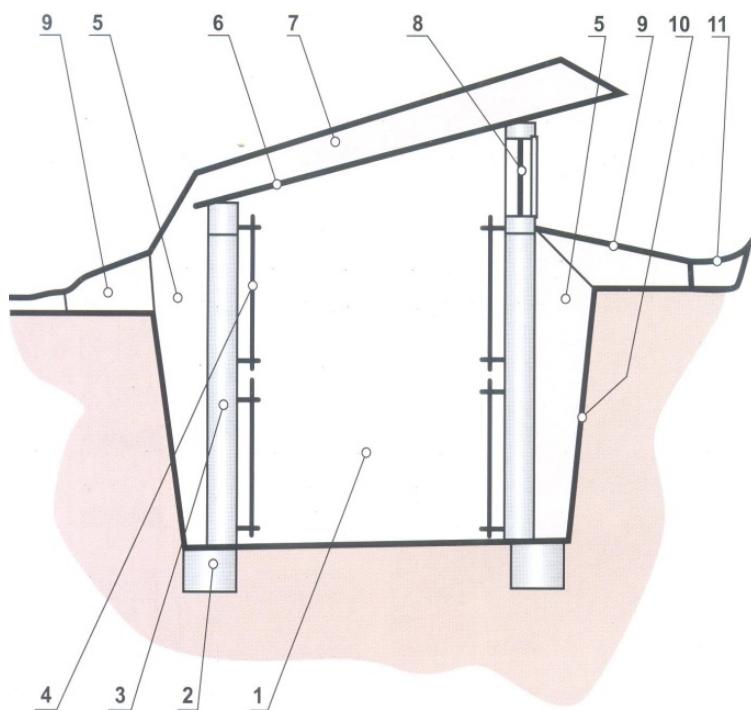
Scheme of trench greenhouse (left): the operating room; 2-strip foundation; 3-metal racks; 4-wall-covering; 5-filling of the insulating material; 6-ceiling overlap; 7-thermal insulation of the roof with waterproofing; 8-laminated window glazing; 9-wall slopes; 10-slope waterproofing; 11-waterproof chute
